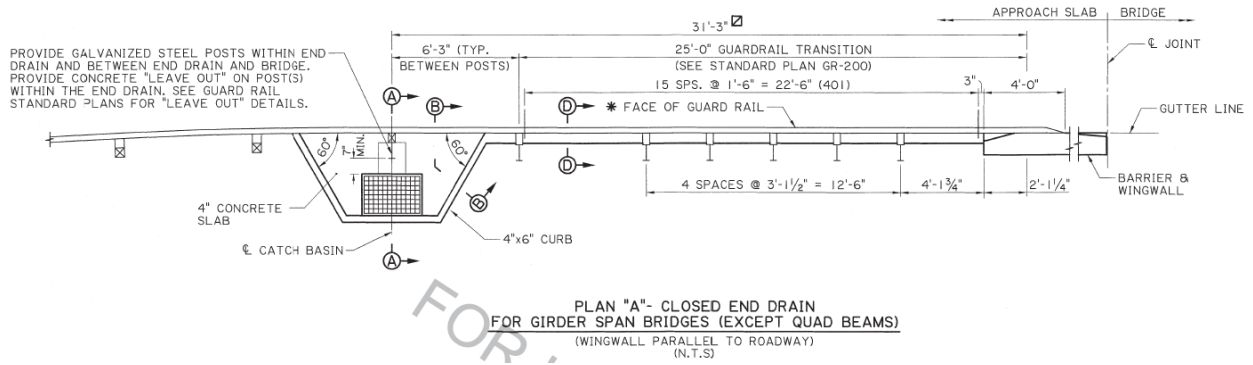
Standard Drawing for Bridge End Closed Drain-LA
